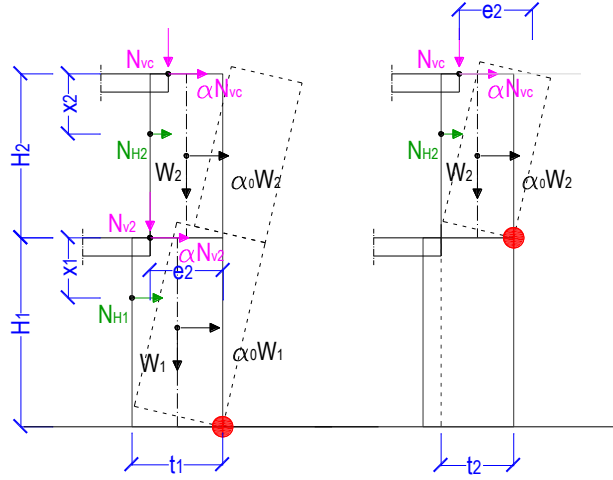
α_0 calculation in the case of overturning of a monolithic wall with 2 floors: forces and hinge individuations.
